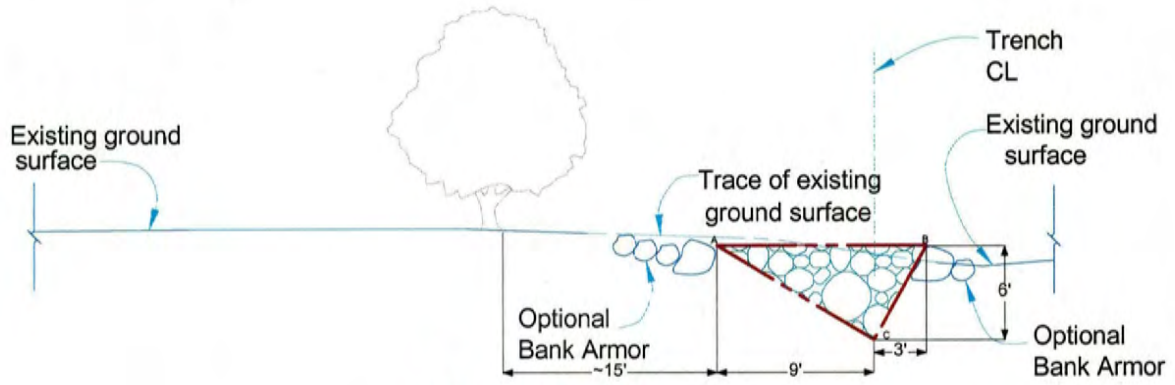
Detail of trench section, A-A. Original placement ADBC. Launched configuration ADEC.
